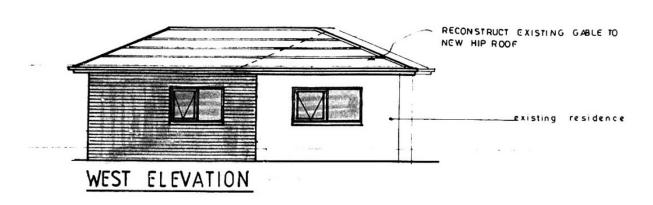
1988 remodelling of the front façade including 'reconstruct existing gable to new hip roof' and the construction of a new front room shown shaded to the left. (Source: City of Camberwell, Building Permit No. 80898, 1986)
